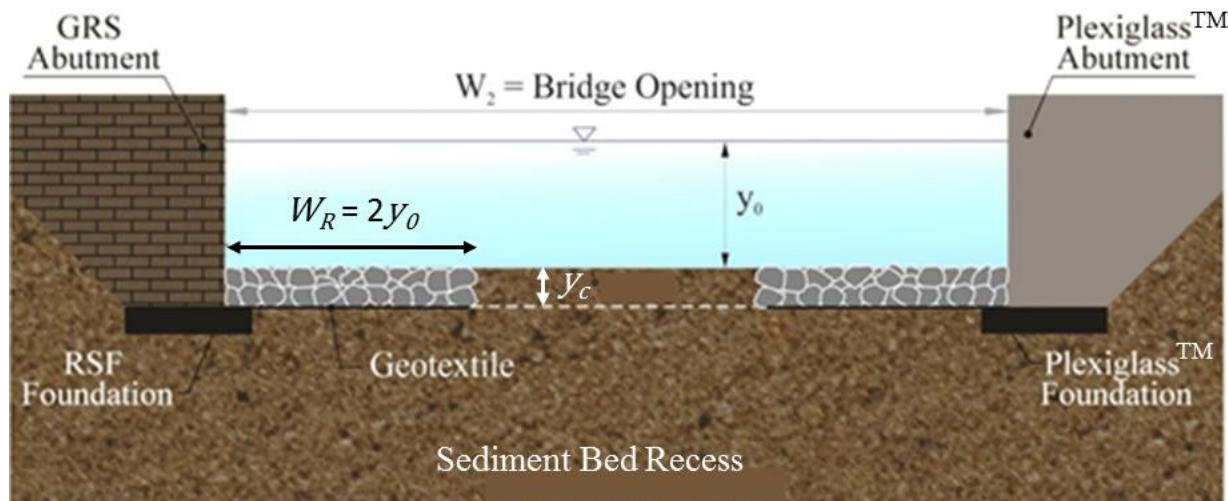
Sketch. Run 1 cross section—HEC-23 DG 14.
